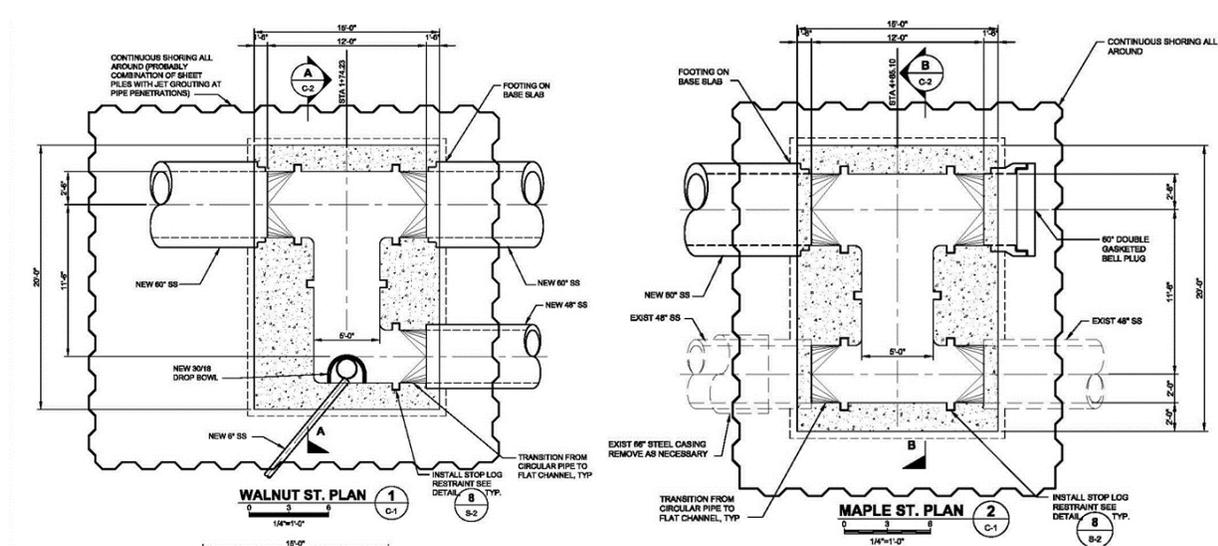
Walnut Street and Maple Street Diversion Structure Record Drawings
